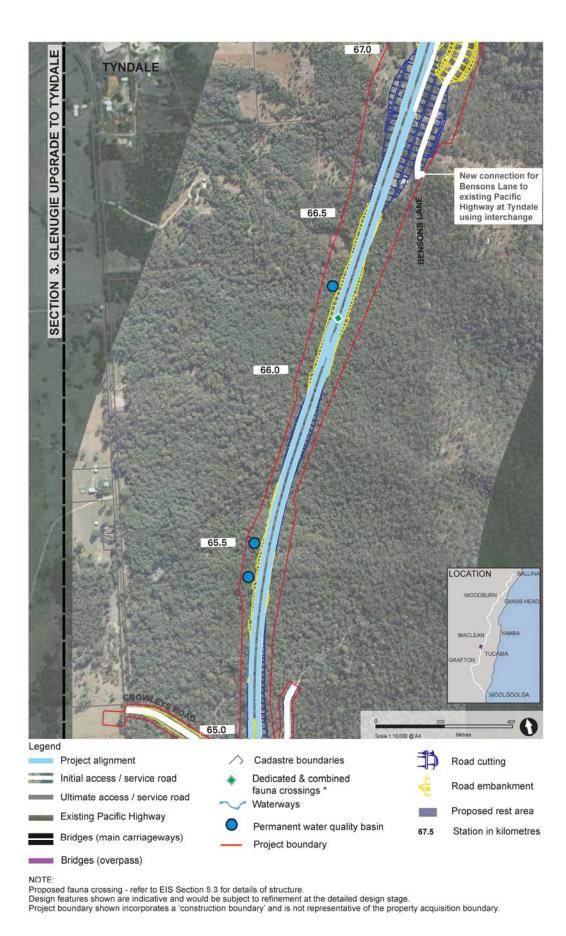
The project - Section 3 (Station 65.0 to 67.0)
